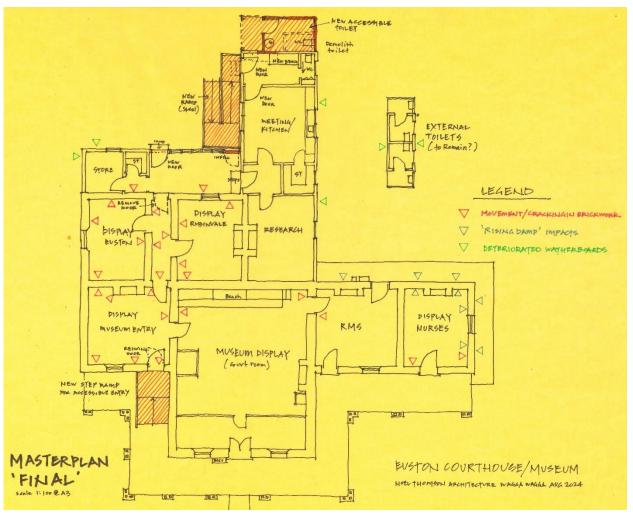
Masterplan Final for the former Courthouse building - Noel Thomson Architecture 2024
